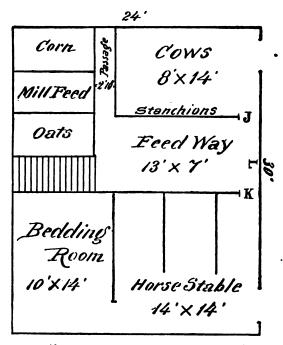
A BASEMENT BARN (GROUND FLOOR).
